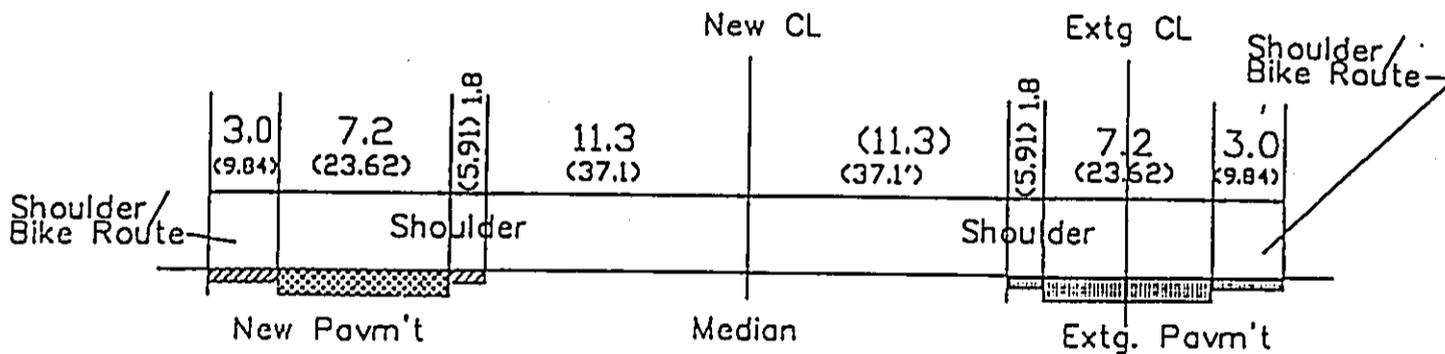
TYPICAL 4 LANE ROAD SECTION
